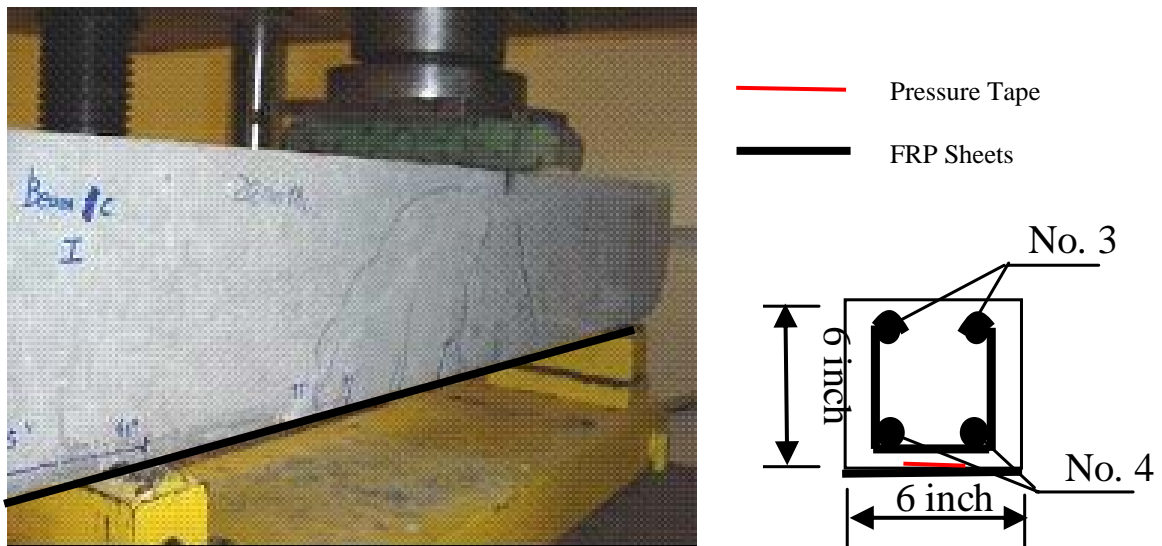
Proposed Test Specimen and Pressure Tape Installation
